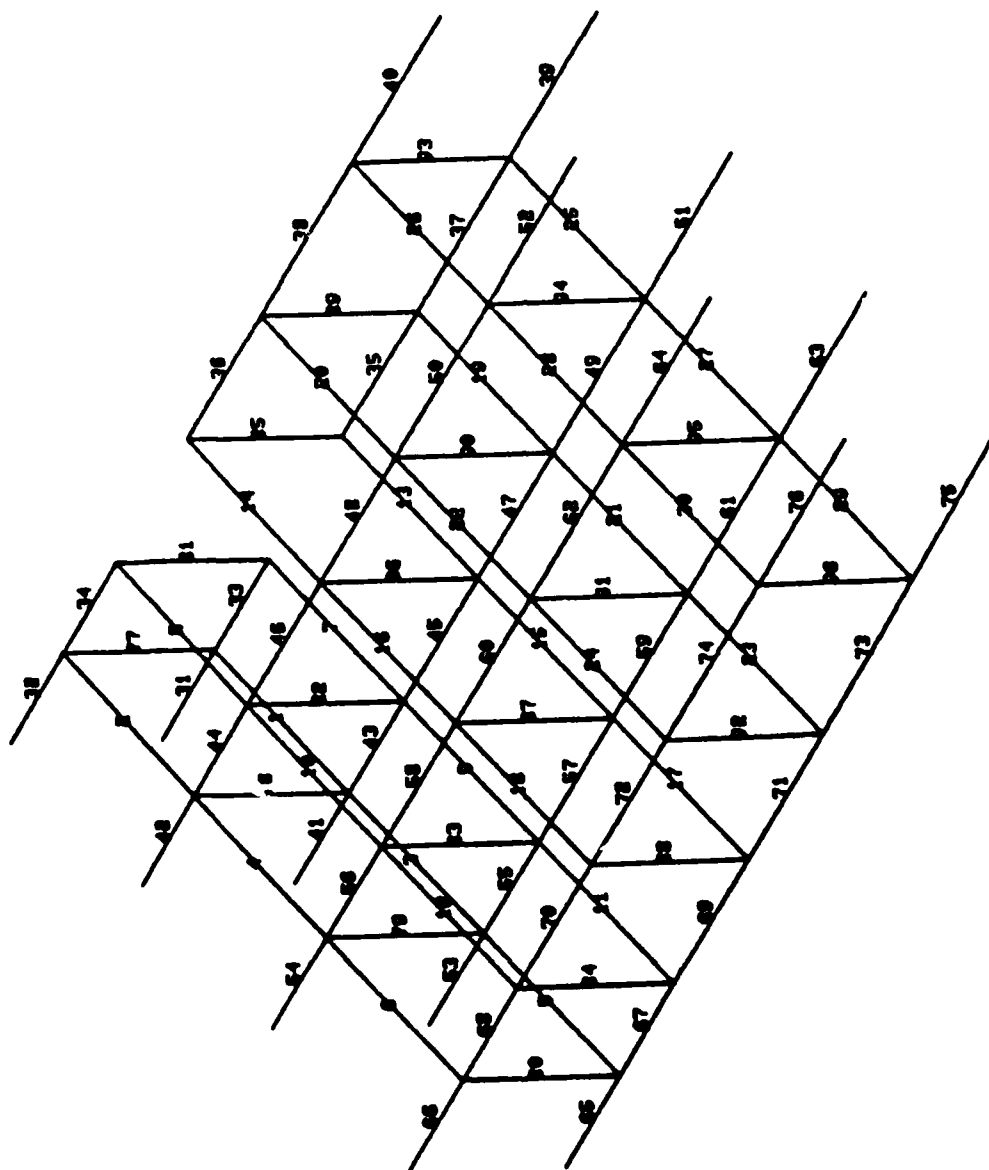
Specimen 4 Finite Element Model - Cap Bar Elements.
